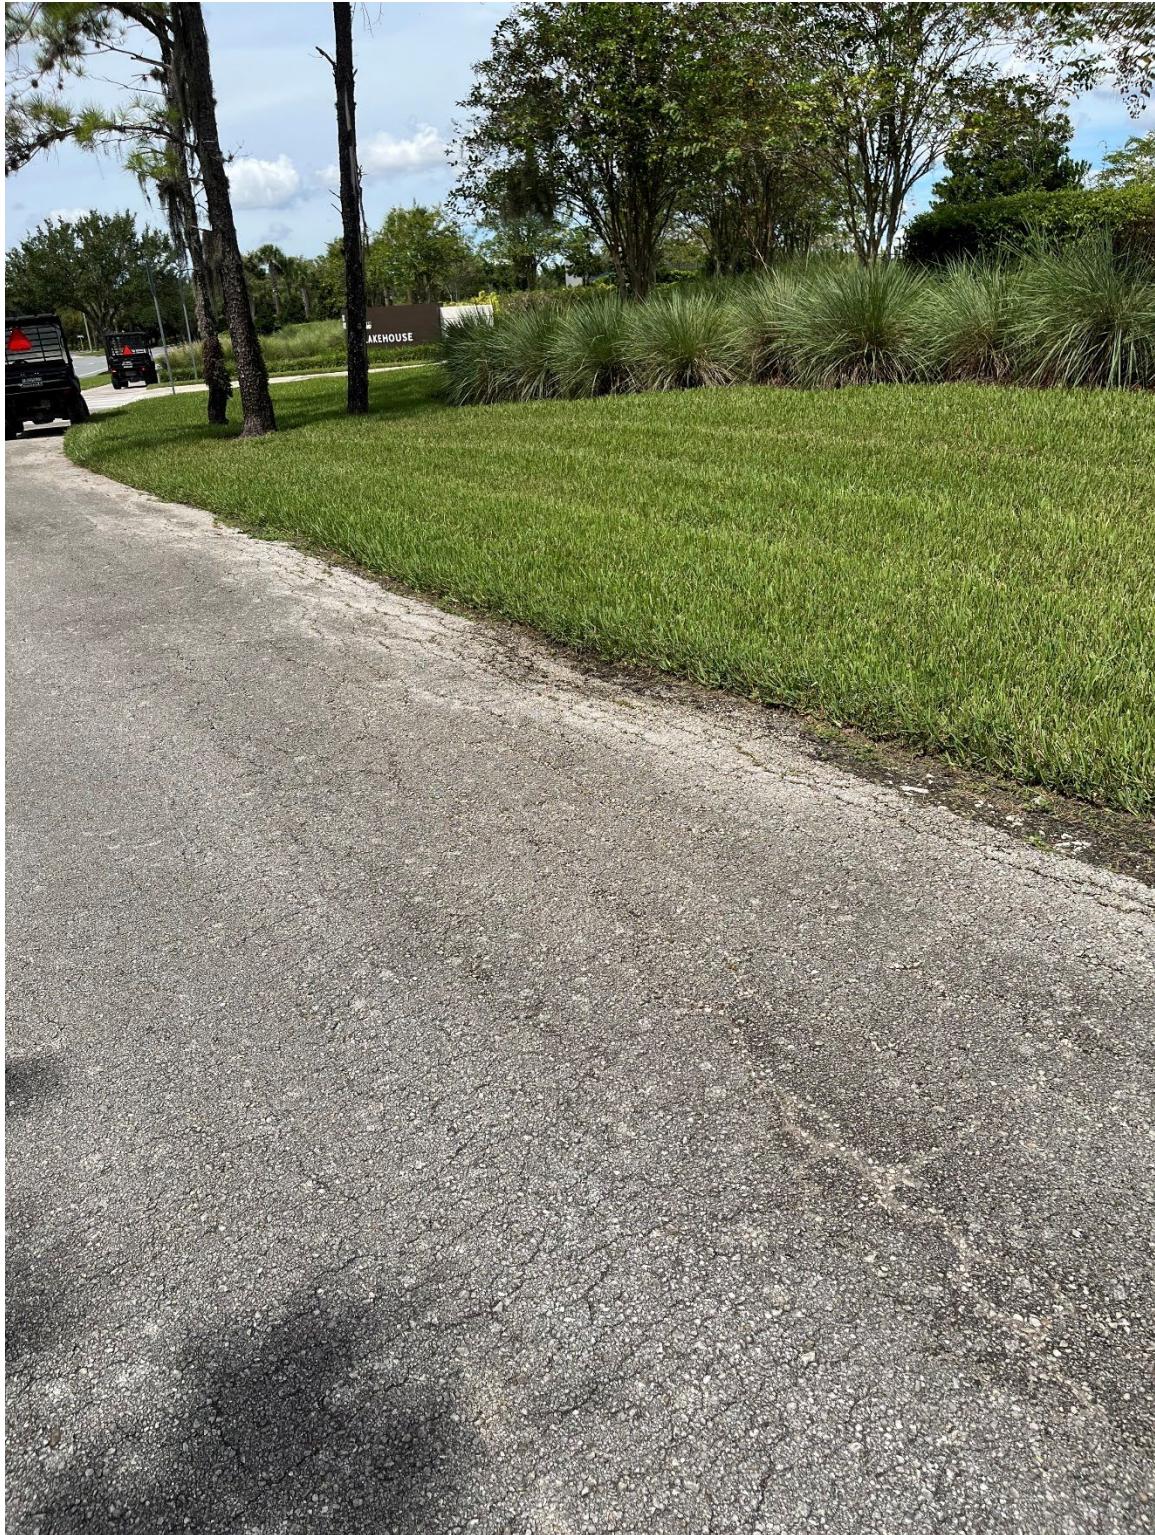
Asphalt Raveling and Base Failure at Meter Box
